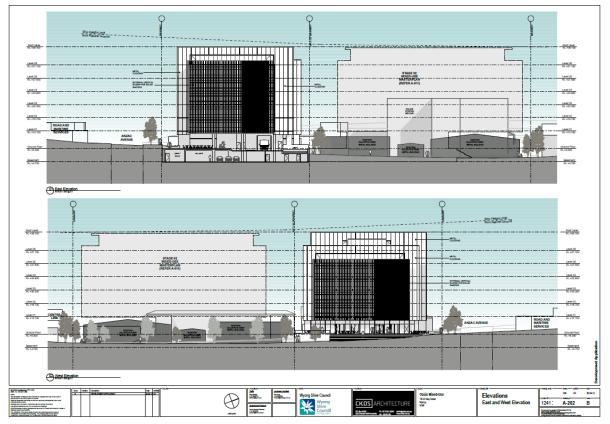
East and west elevations of proposed Stage 1 mixed use commercial and retail development.
